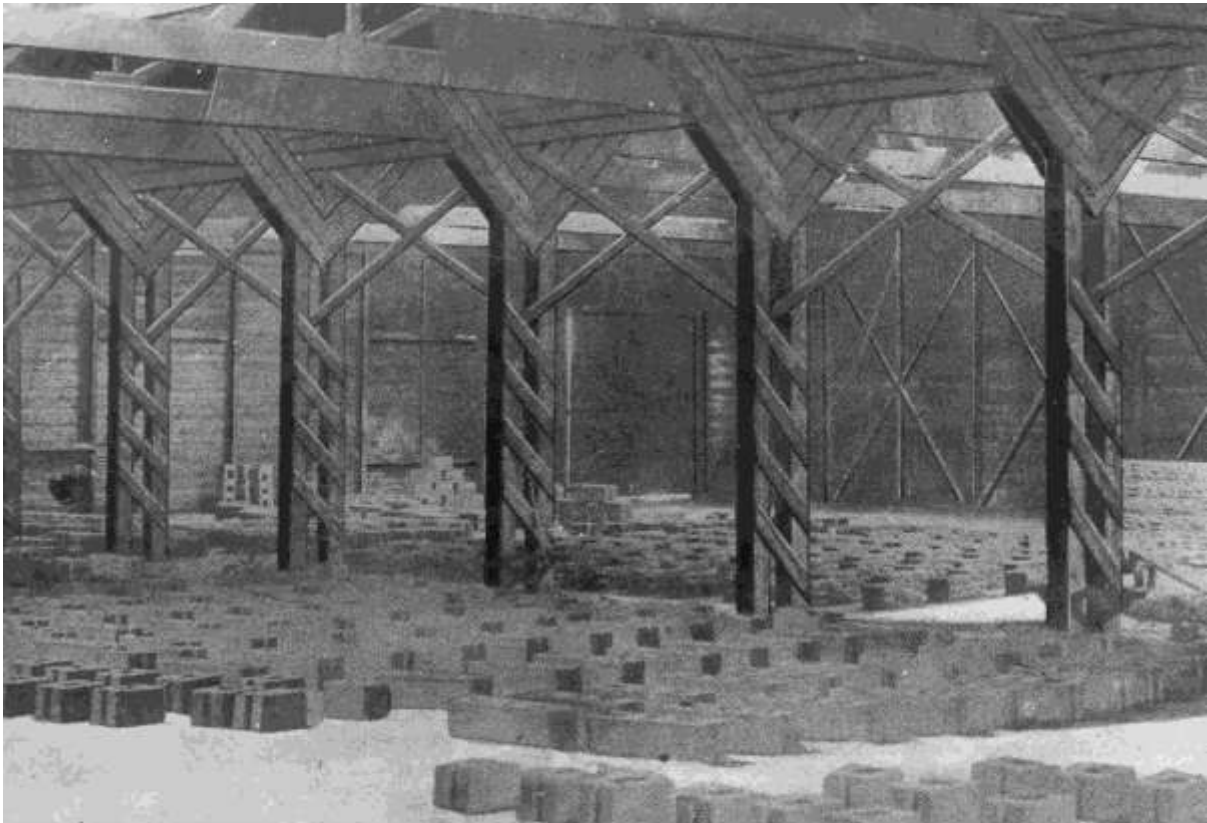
showing interior of hangar in Drome Road, with blocks manufactured for Y.M.C.A. building
